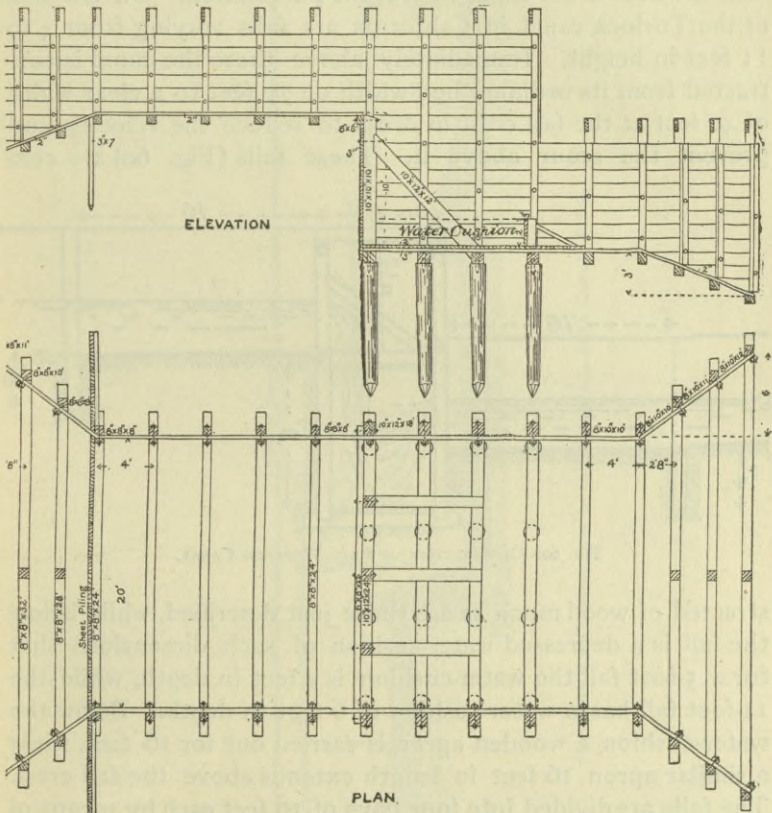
PLAN AND CROSS-SECTION OF FALL, BEAR RIVER CANAL.
